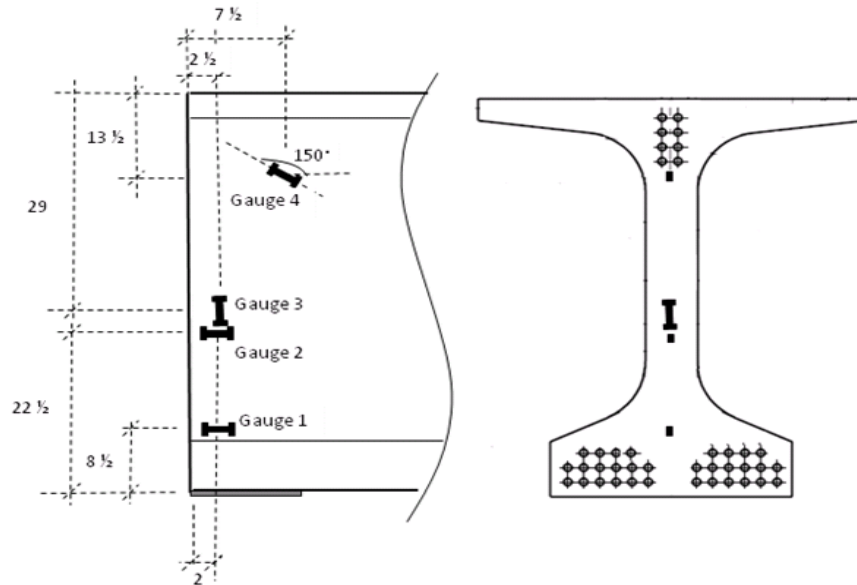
Locations and orientations of the 4 gages installed on the pilot girder marked on the side view (left) and the cross section view (right).
